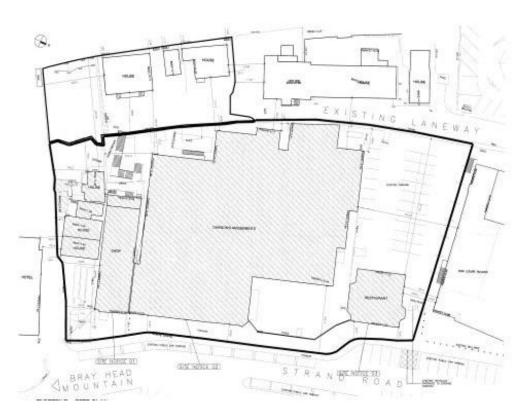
Site Plan of the previous 'Dawson's Amusement' building which was demolished as part of Reg. Ref. 12/630002.
